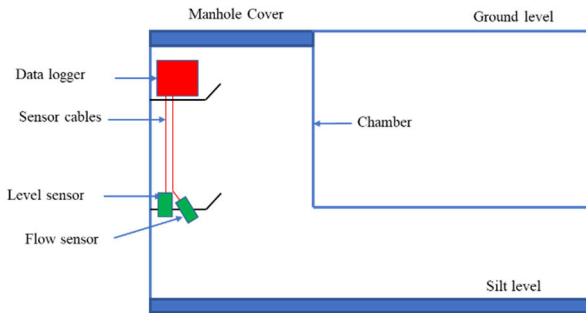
Cross-section schematic drawing of the sensors installed in the manhole.
